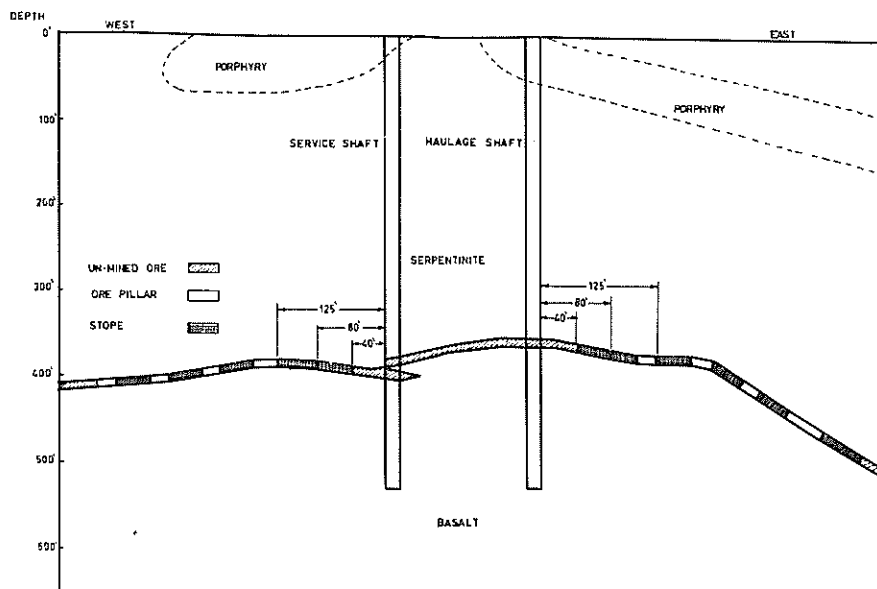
Stope & Pillar Mining Layouts (E-W Section)
